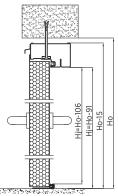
Installation of a single-leaf door to a masonry wall – internal frame with a thermal break - vertical cross-section
